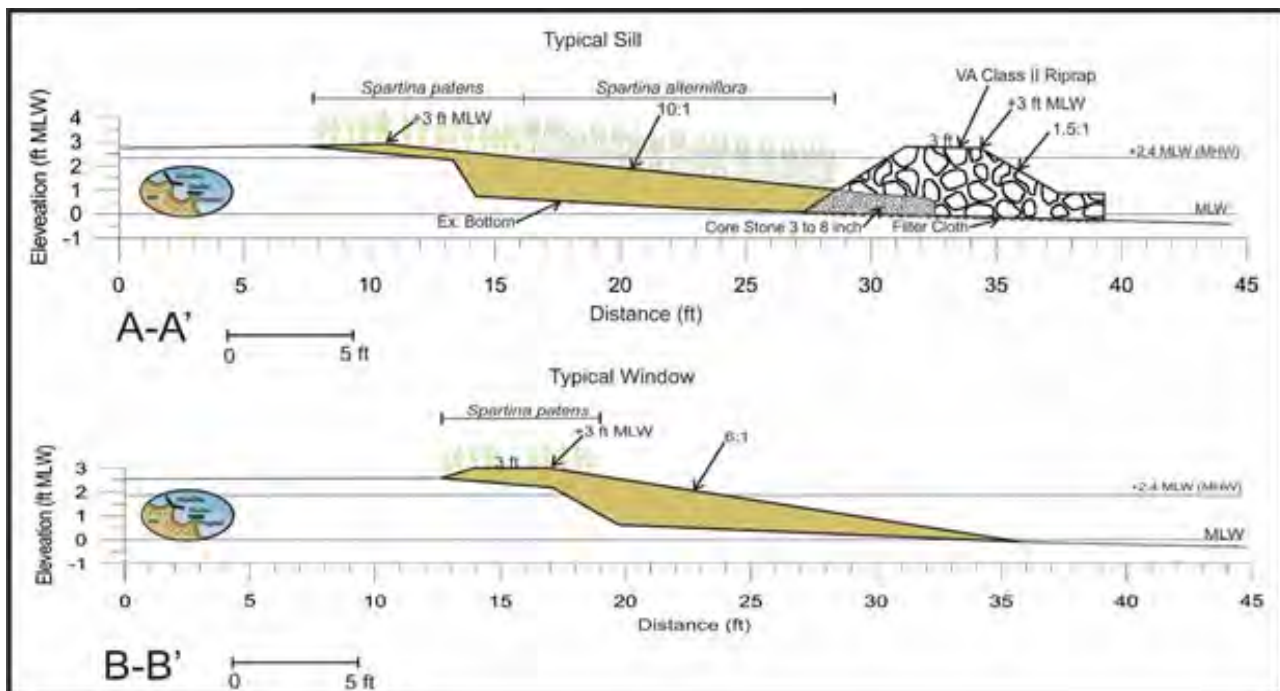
Typical cross-section of shore protection structures proposed at Captain Sinclair's Recreational Area.
